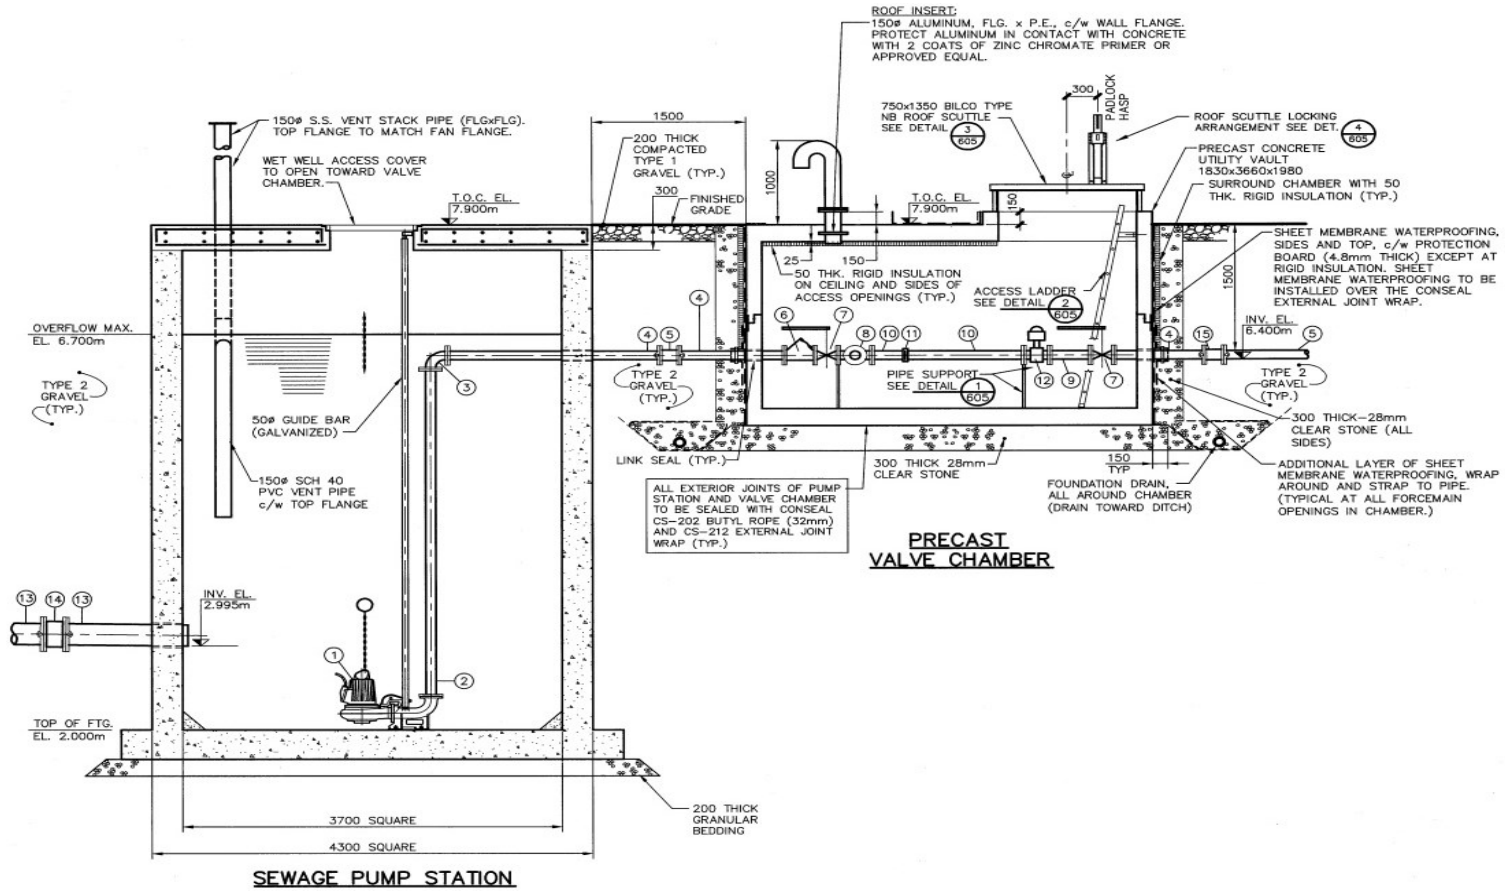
Akerley Boulevard physical layout – lift-station elevation view.
